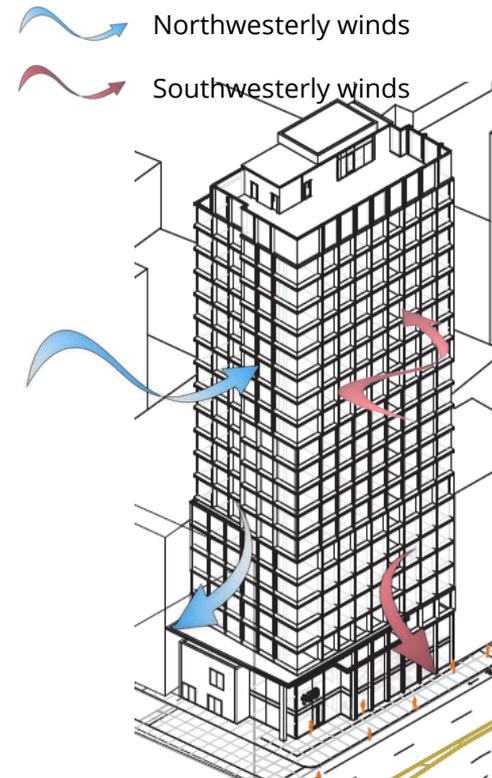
3D Rendering of the Proposed Development – View from Southwest
